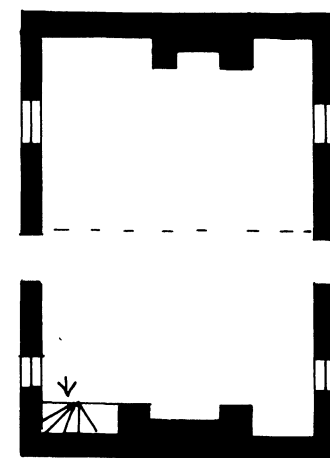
Eugene Crosby House Plan. Two-room, hall-parlor plan.
